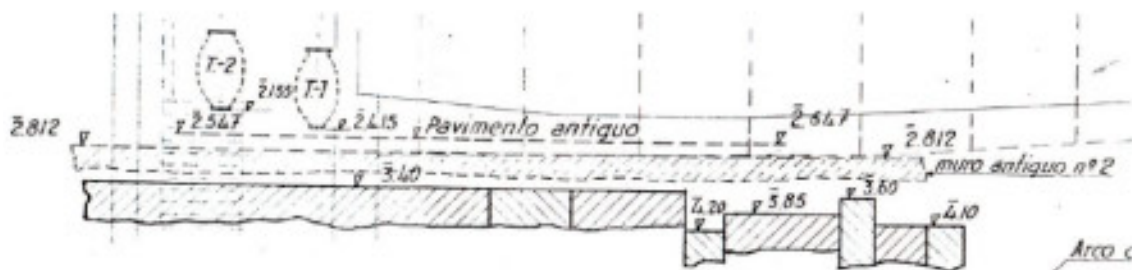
Original site section of the Cine Imperial site (González Acuña, 2010: 89).
